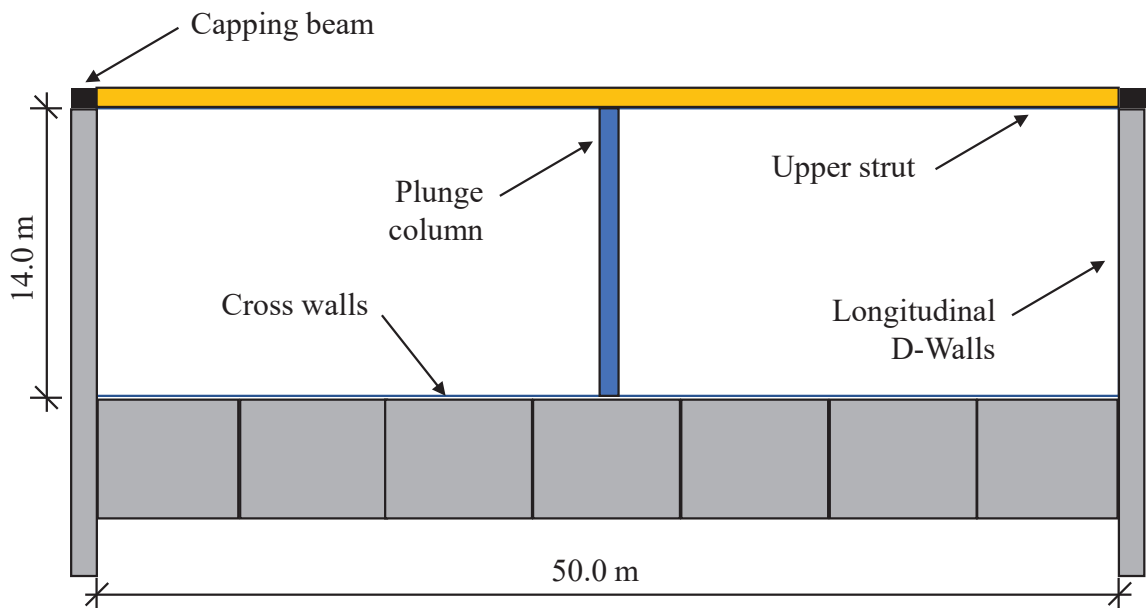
Cross section shows cross walls running perpendicular to the longitudinal D-Walls and the enormous free space below the strut layer for tunnel construction
